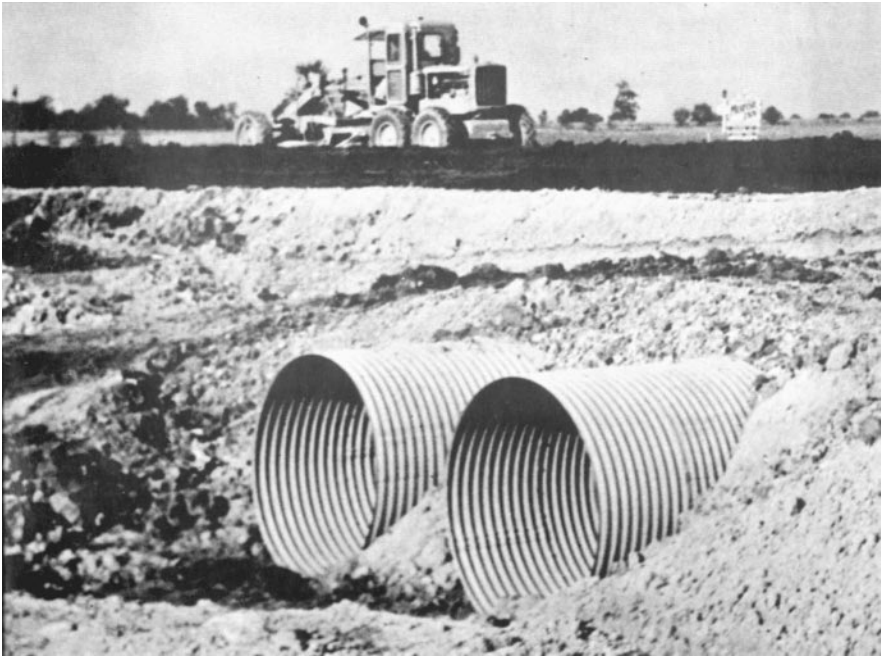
Typical corrugated metal pipe culvert installation on interstate highway system.^{1.87}
